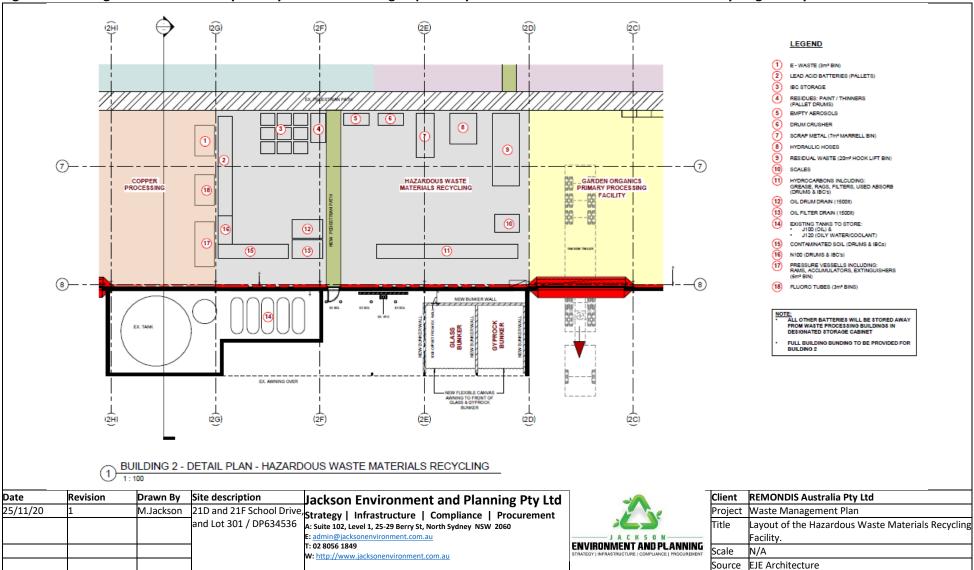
Tomago Resource Recovery Facility and Truck Parking Depot – Layout of the Hazardous Waste Materials Recycling Facility.
